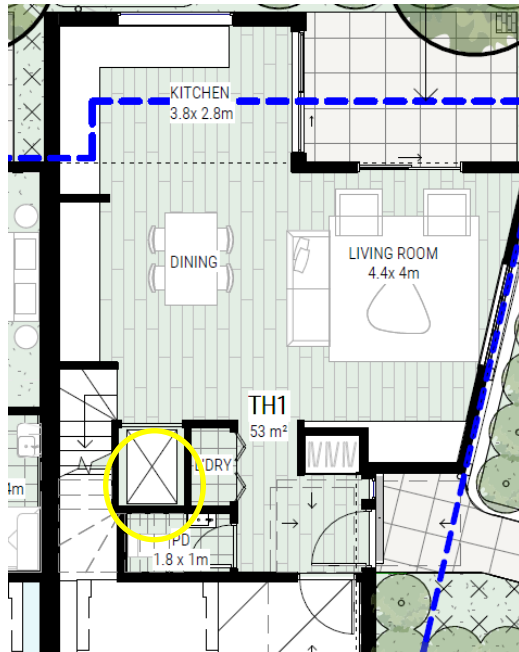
excerpt of the ground floor plan showing that the proposed passenger lift is appropriately located to achieve access within the dwelling
